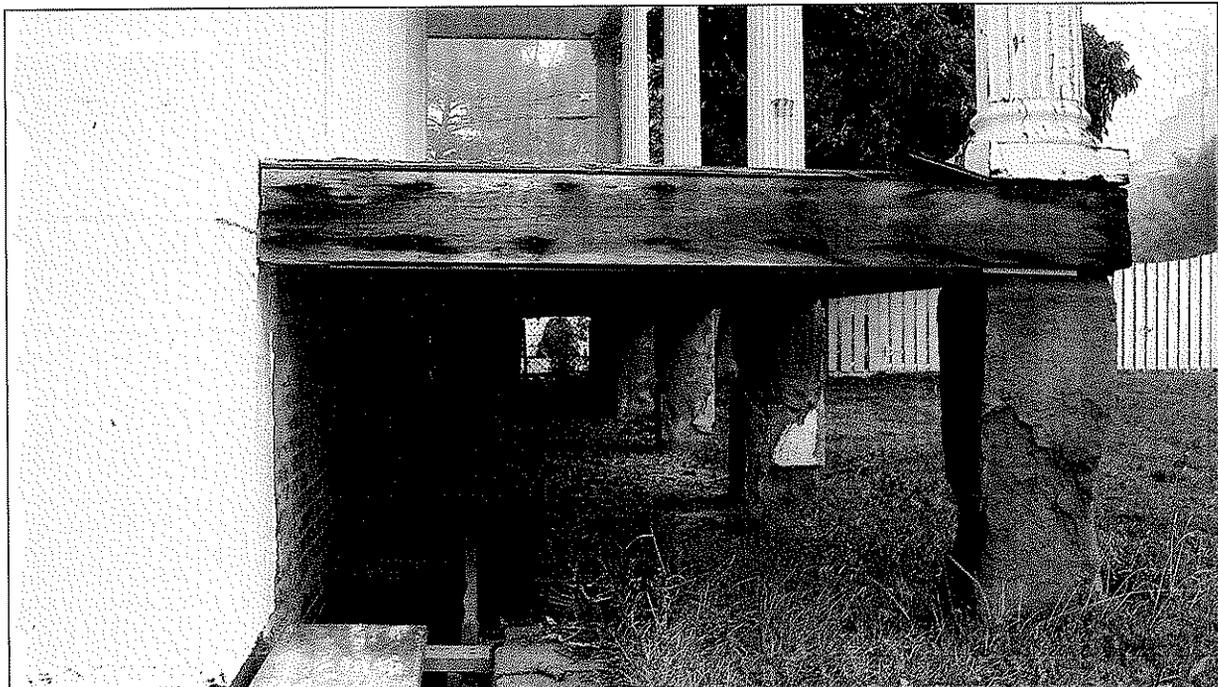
Figure C: Brick moat retaining wall and sandstone piers under east veranda
